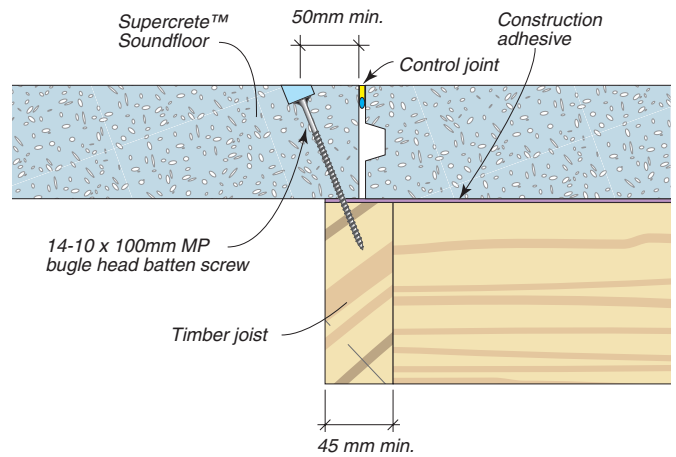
Detail C. Cross-section of Supercrete™ 75mm Soundfloor Installation on Timber Joists
